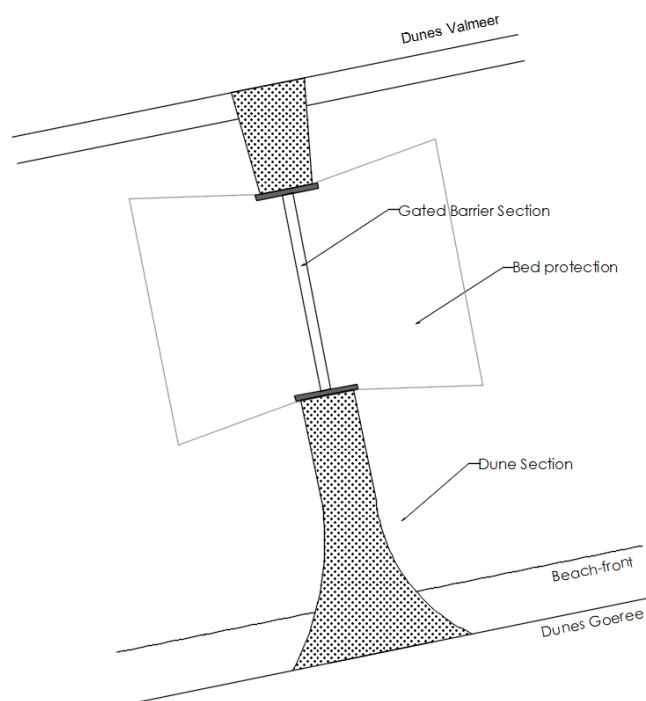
Proposed Delta21 sand-dune barrier layout
